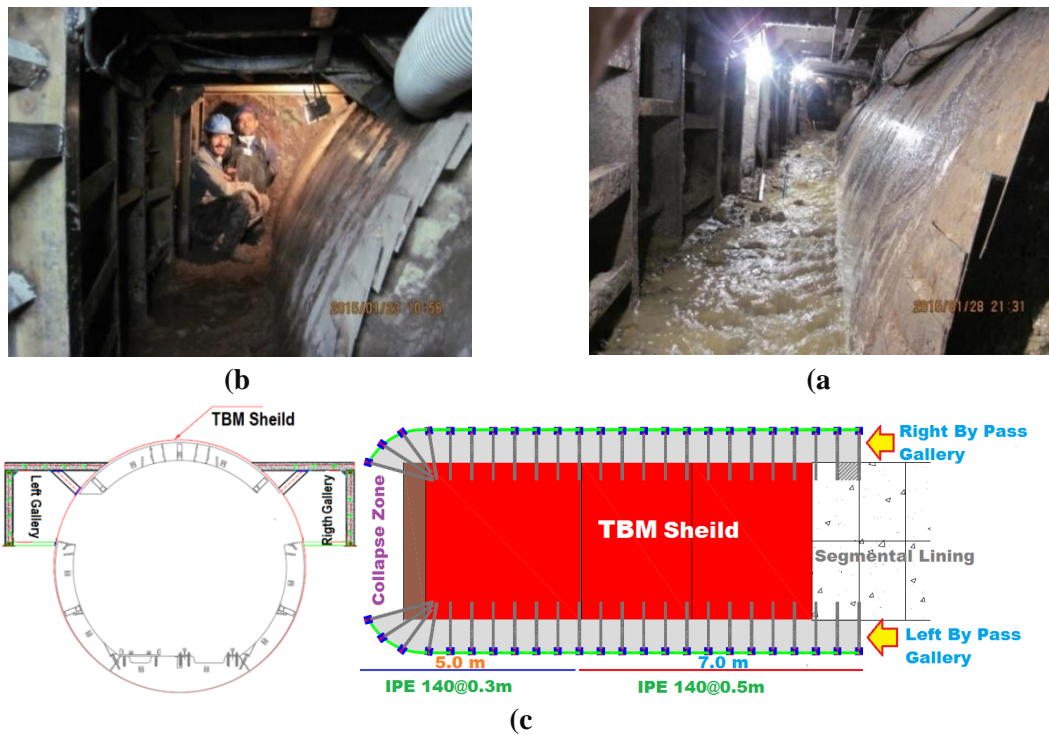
Bypass gallery excavation: (a) right side of TBM, (b) left side, (c) plan and section of bypass gallery
